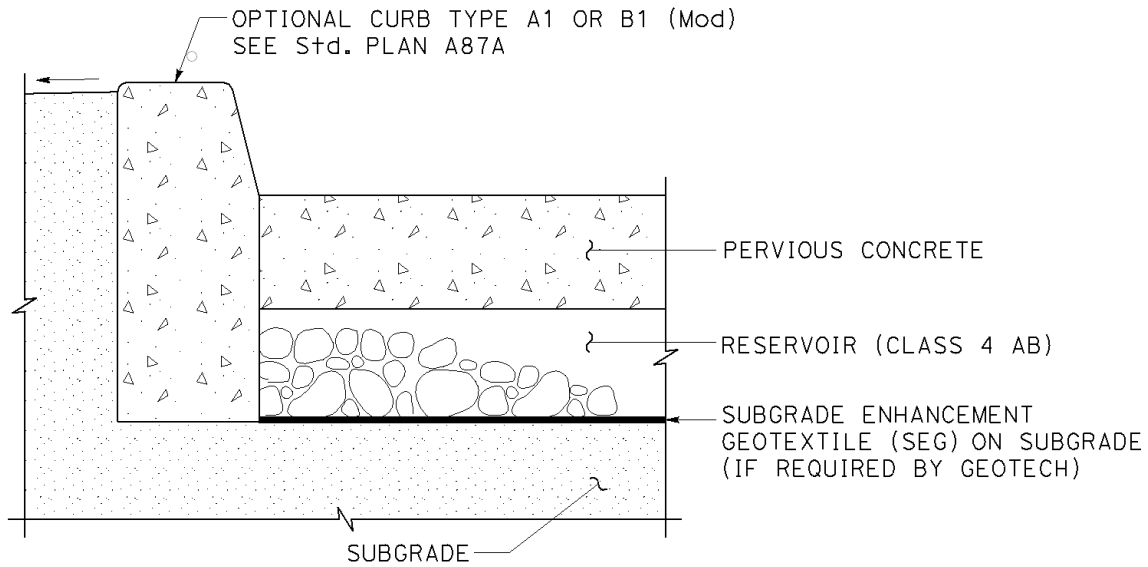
Pervious Concrete Pavement (PCP) Typical Section
